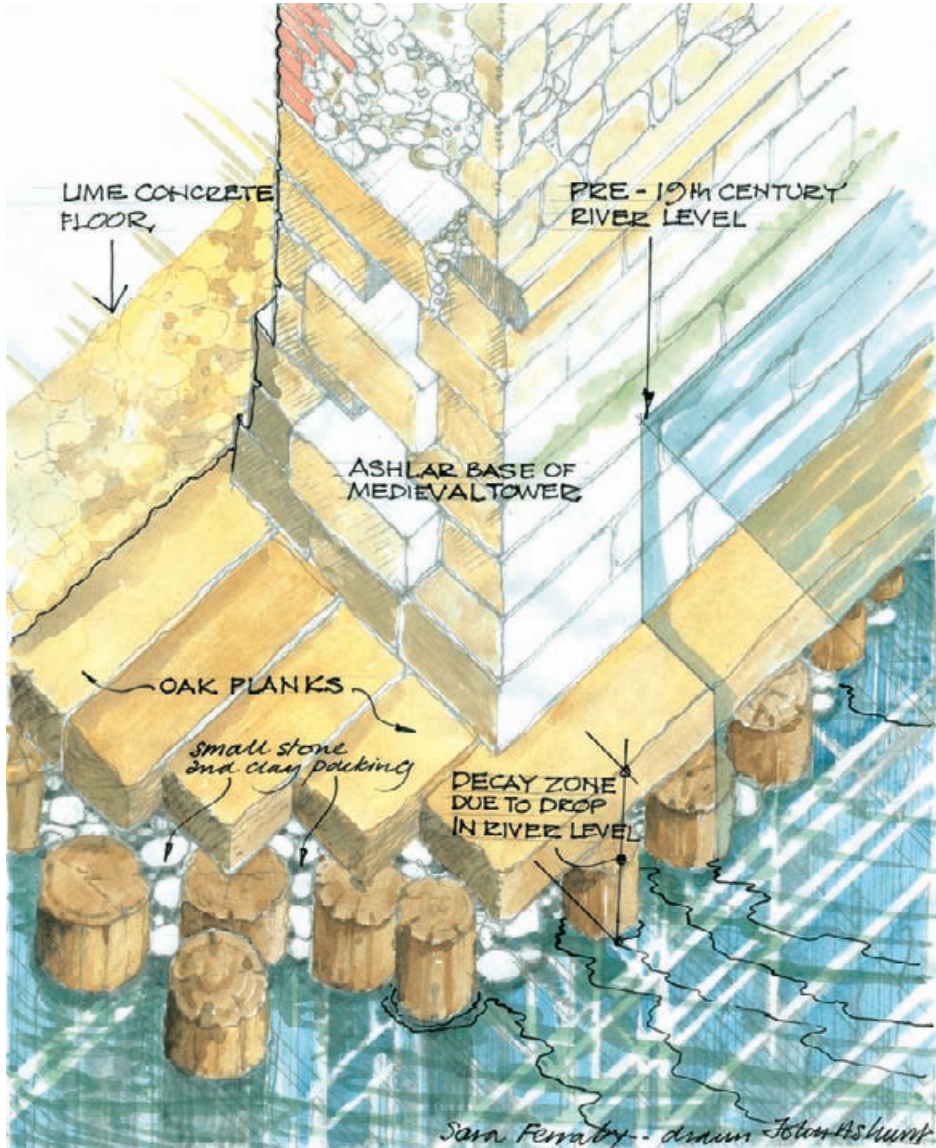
Medieval timber piling, Byward Tower, Tower of London. Plants and pile-heads remained sound until the water level dropped, exposing the critical zone below the masonry to drying, wetting/drying cycles and decay. Settlement and facturing of the masonry followed, requiring dry-packed mortar to make the load bearing connection between piles and wall base. Casework: Sara Ferraby. Drawn by John Ashurst.
